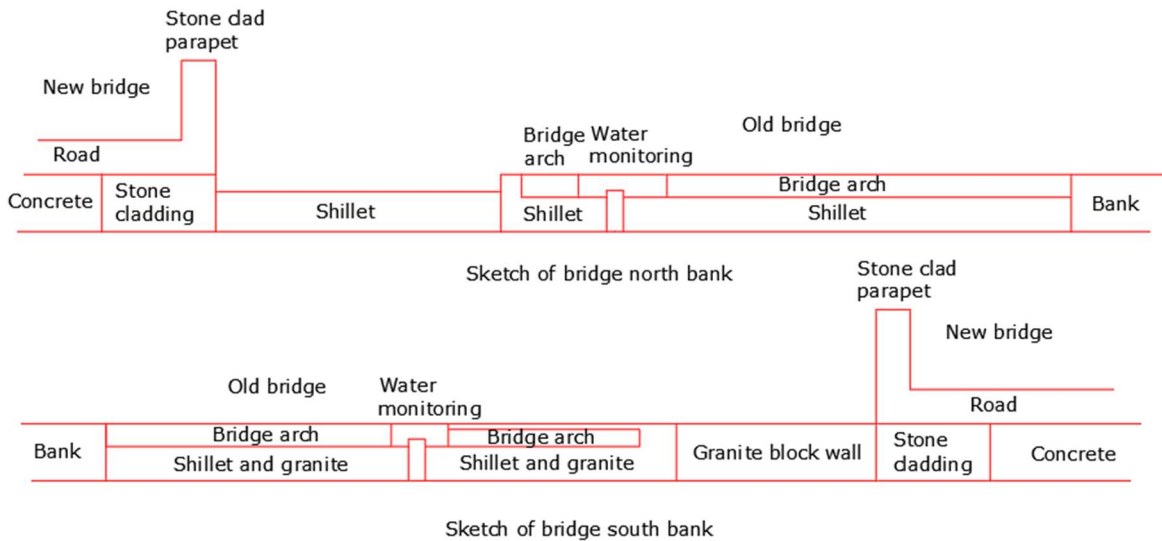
Sketches of the 19th century Cocks Hill Bridge arch elevations.
